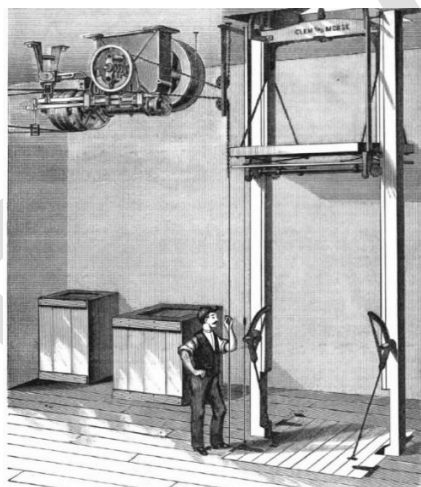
(left): Illustrative view of a Clem & Morse elevator with automatic hatch doors.
